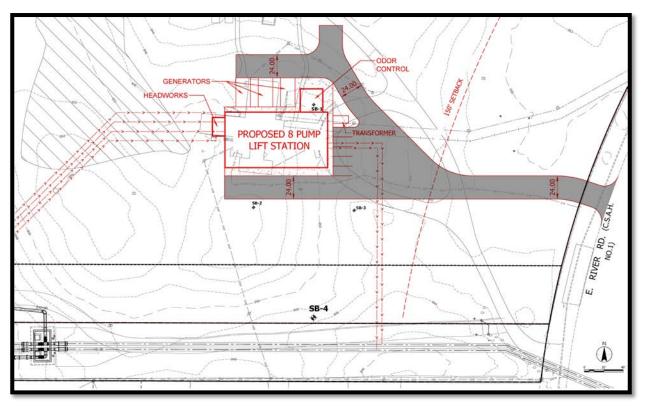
Site Plan for Alternative 3 - East Side Facilities
